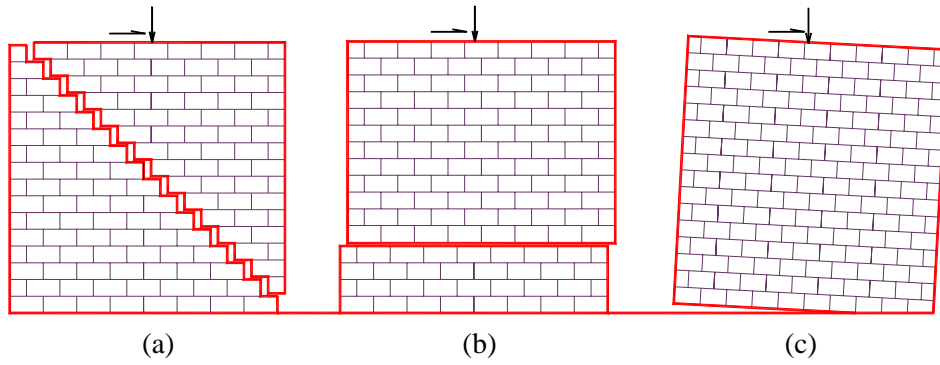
In-plane failure modes of a laterally loaded URM wall:
